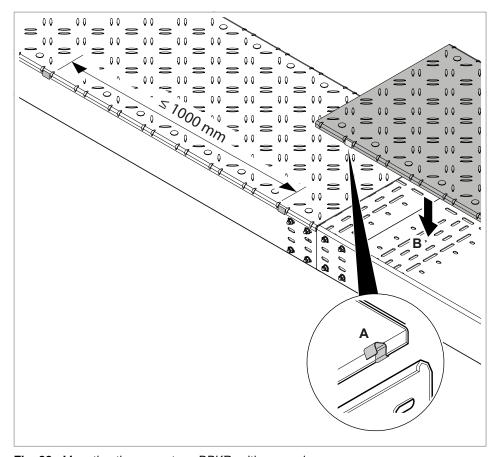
Mounting the cover, type DBKR, with cover clamps
